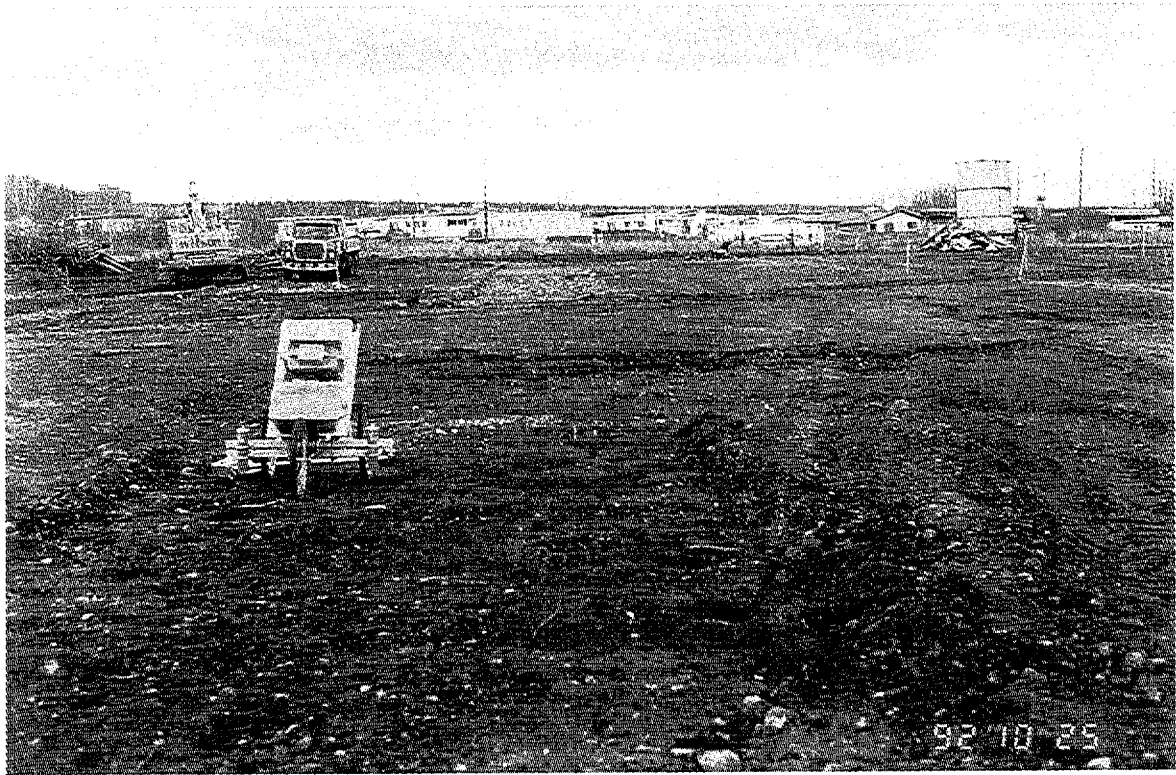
Large area gamma survey (LAGS) system in use to verify shallow waste removal excavation, Fort McMurray, Alberta, Canada.
